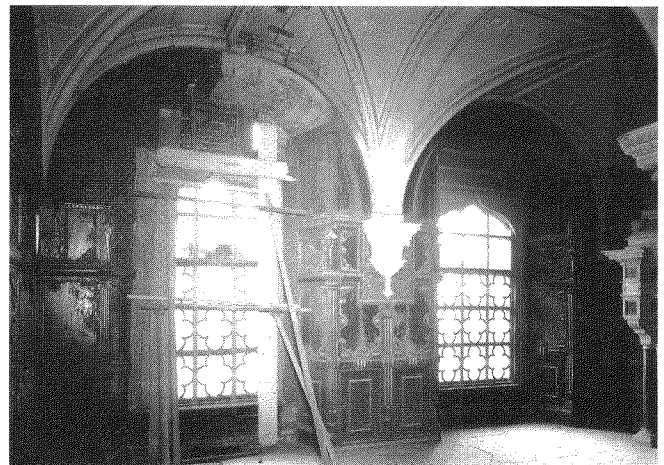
North wall (Gothic windows added circa 1750). Repairs carried out in 1953 revealed small upper window openings that had been blocked.
